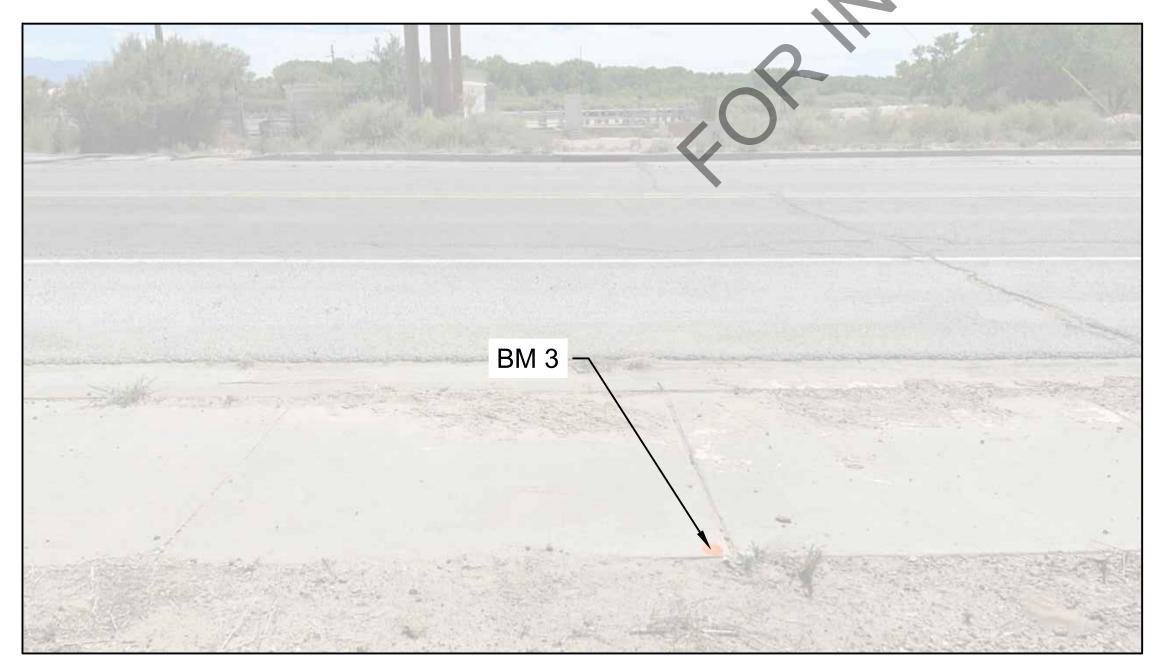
BENCHMARK 3 LOCATION PHOTO
